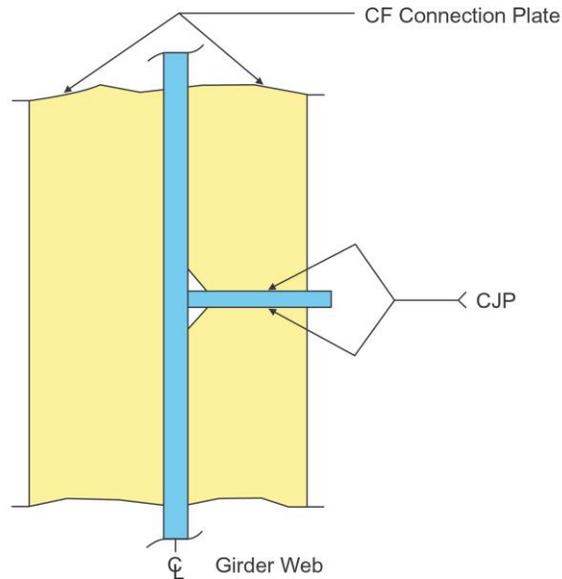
Sketch of a longitudinal and transverse stiffener intersection detail
